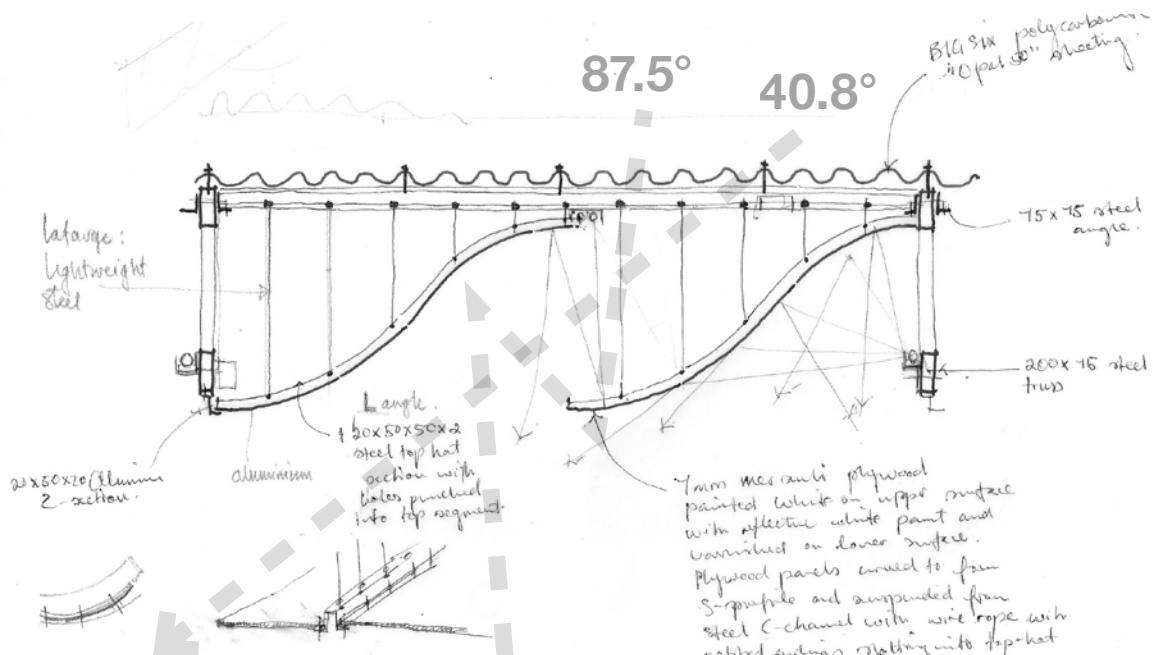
Detail design sketch experimenting with seasonal light angles and profile shapes. Plywood panels are painted white on their upper sides to reflect direct light away during summer and create diffuse lighting.
